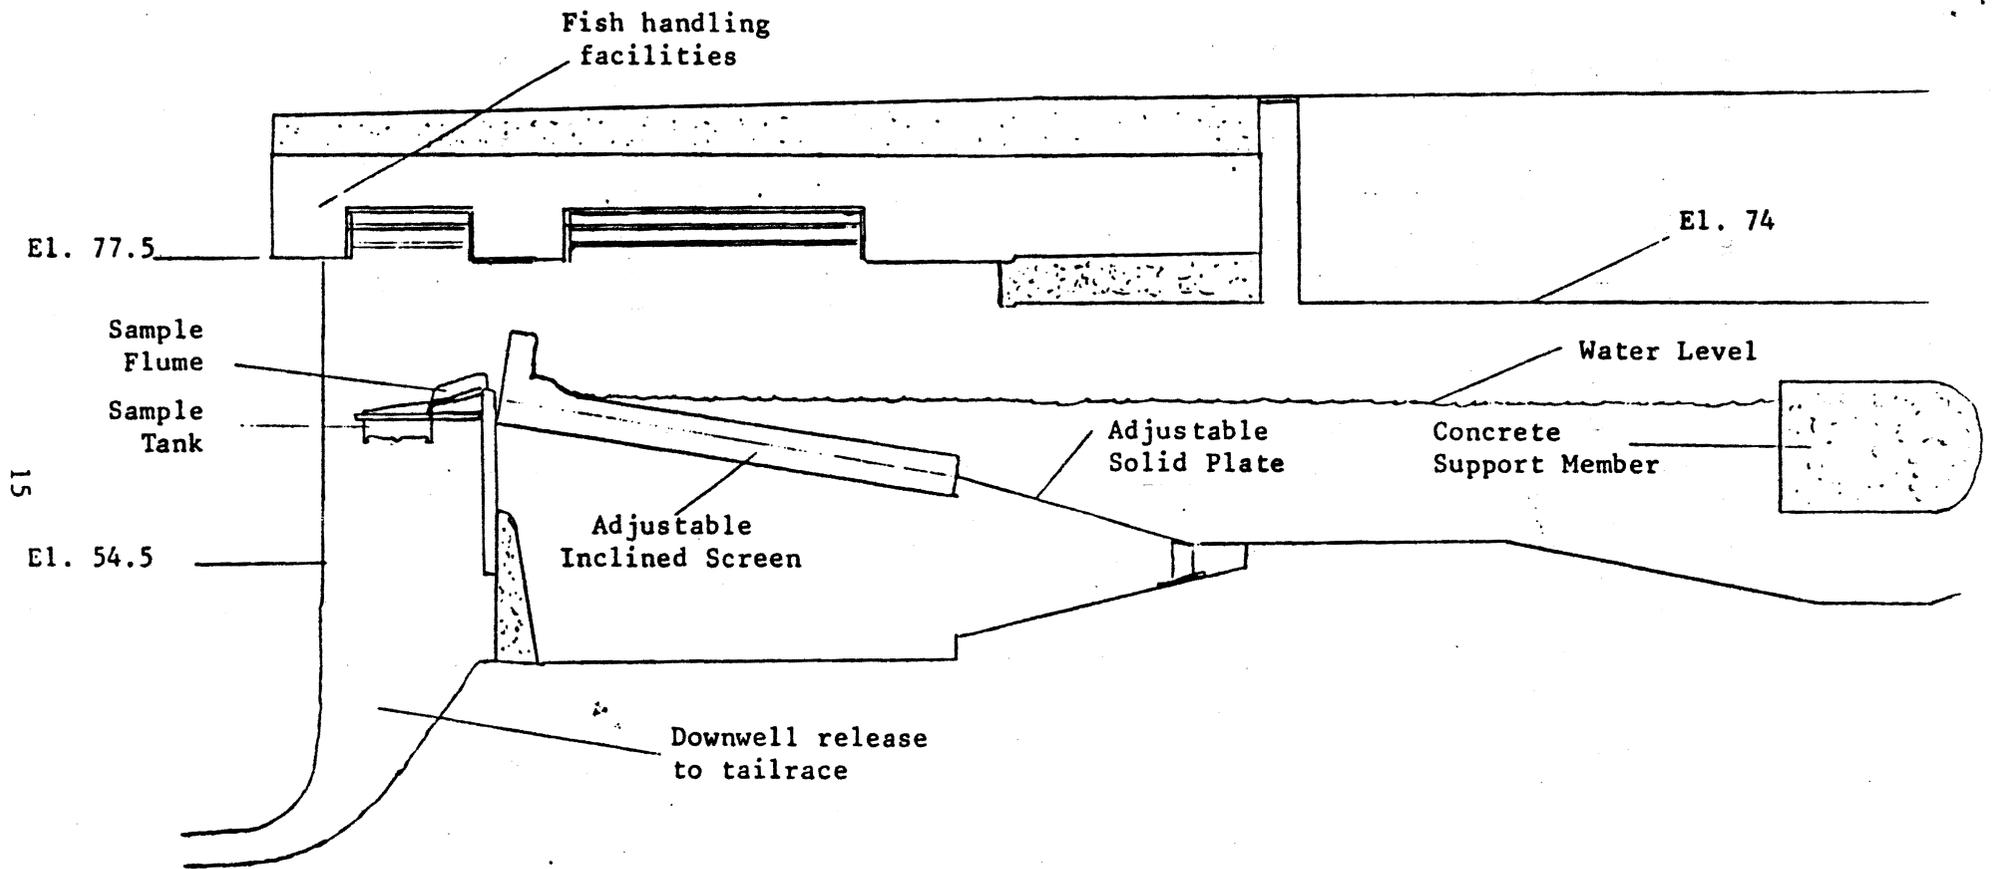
Cross-section of the juvenile bypass (downstream end) system at Bonneville Dam First Powerhouse, 1984.
